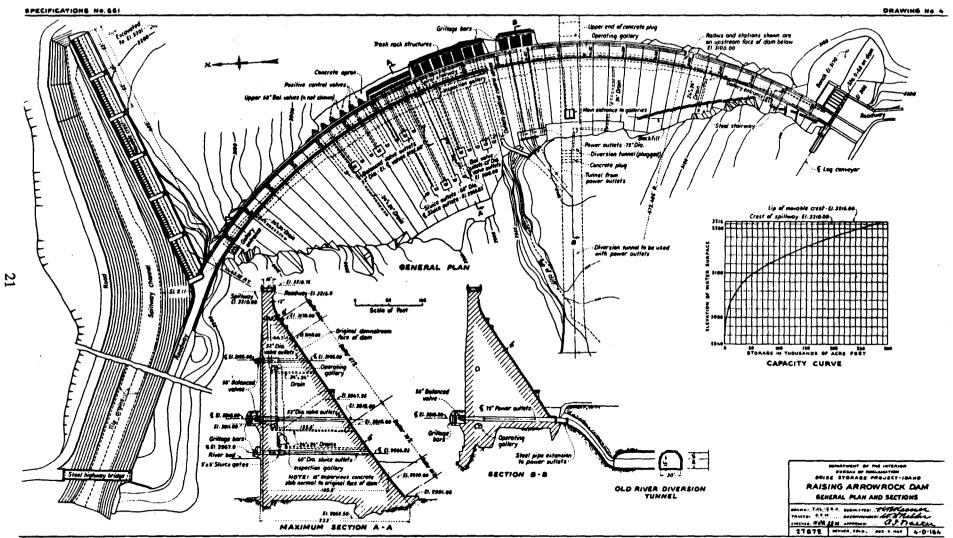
Raising Arrowrock Dam, general plan and sections.
